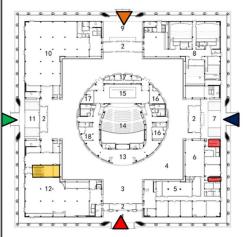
The Ground Floor -source: www.archdaily.com+ student work
